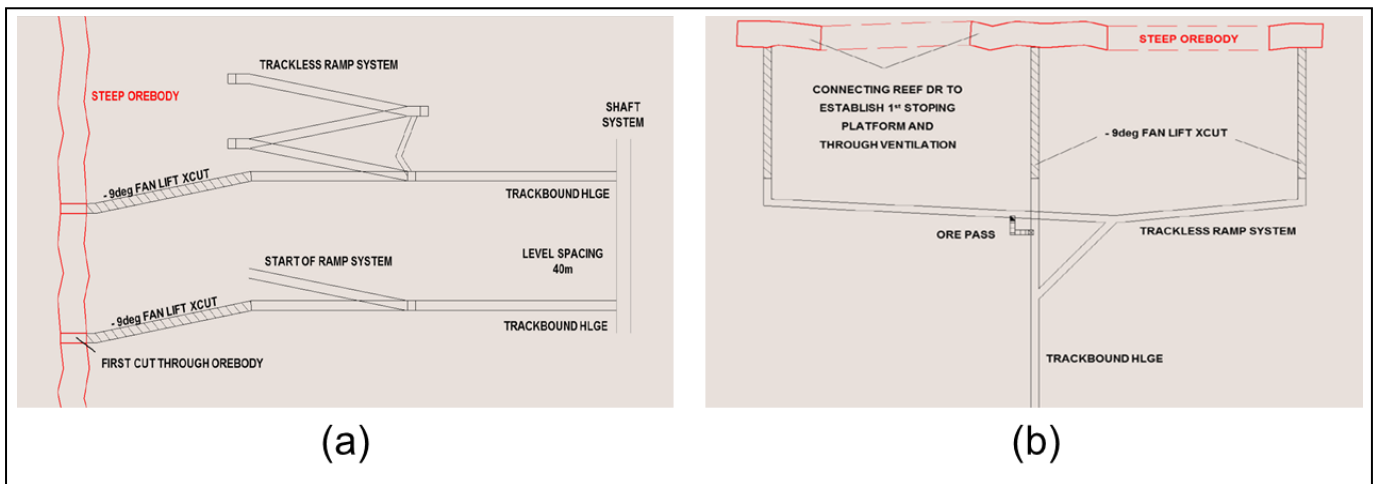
(a) Cross-section and (b) plan view of mechanised cut and fill mining.
